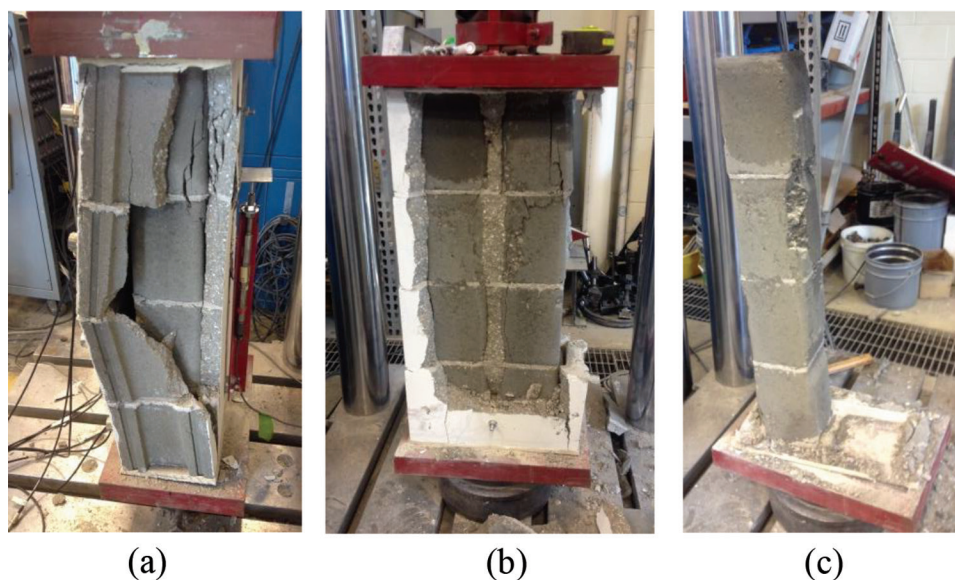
Failure mechanism of four-blocks CMUs prisms (no rubber): (a) rupture of webs; (b) rupture of face shells; (c) grout after failure (note minor cracking in grout in different pictures).
